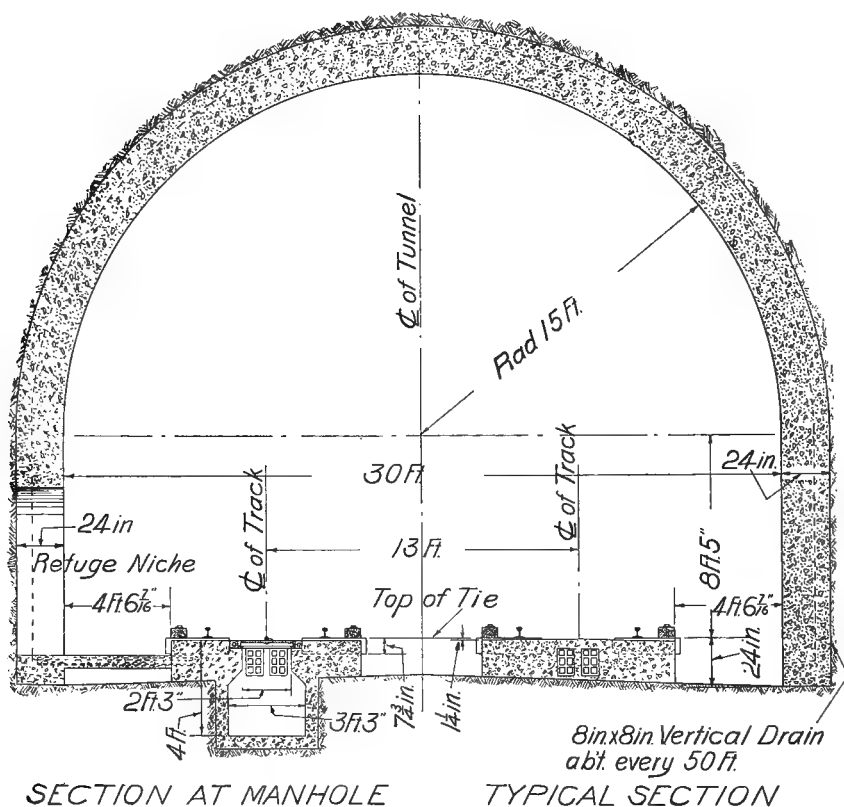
CROSS SECTION, NEW BERGEN HILL TUNNEL.
